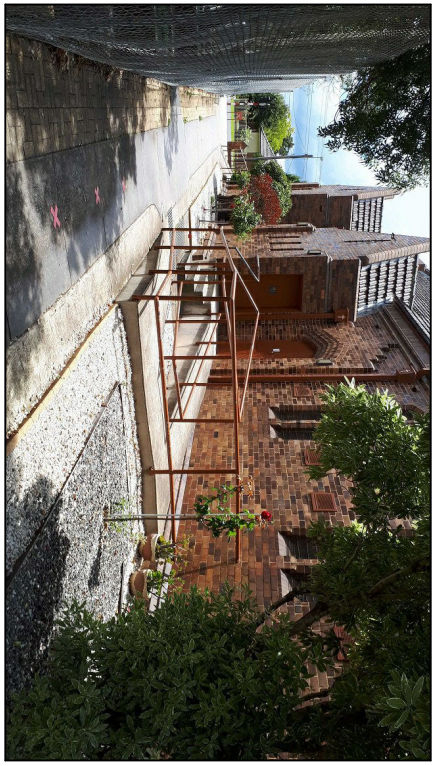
WESTERN ELEVATION OF CHURCH BUILDING
